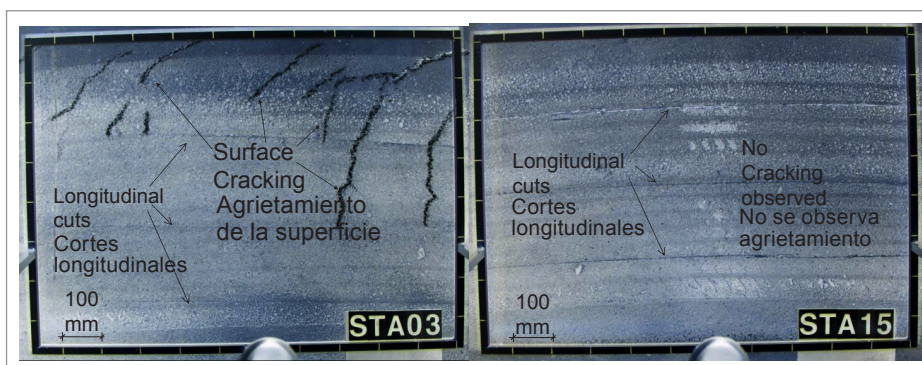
Photo of pavement section B12C10 (left) and B14C10 (right)
